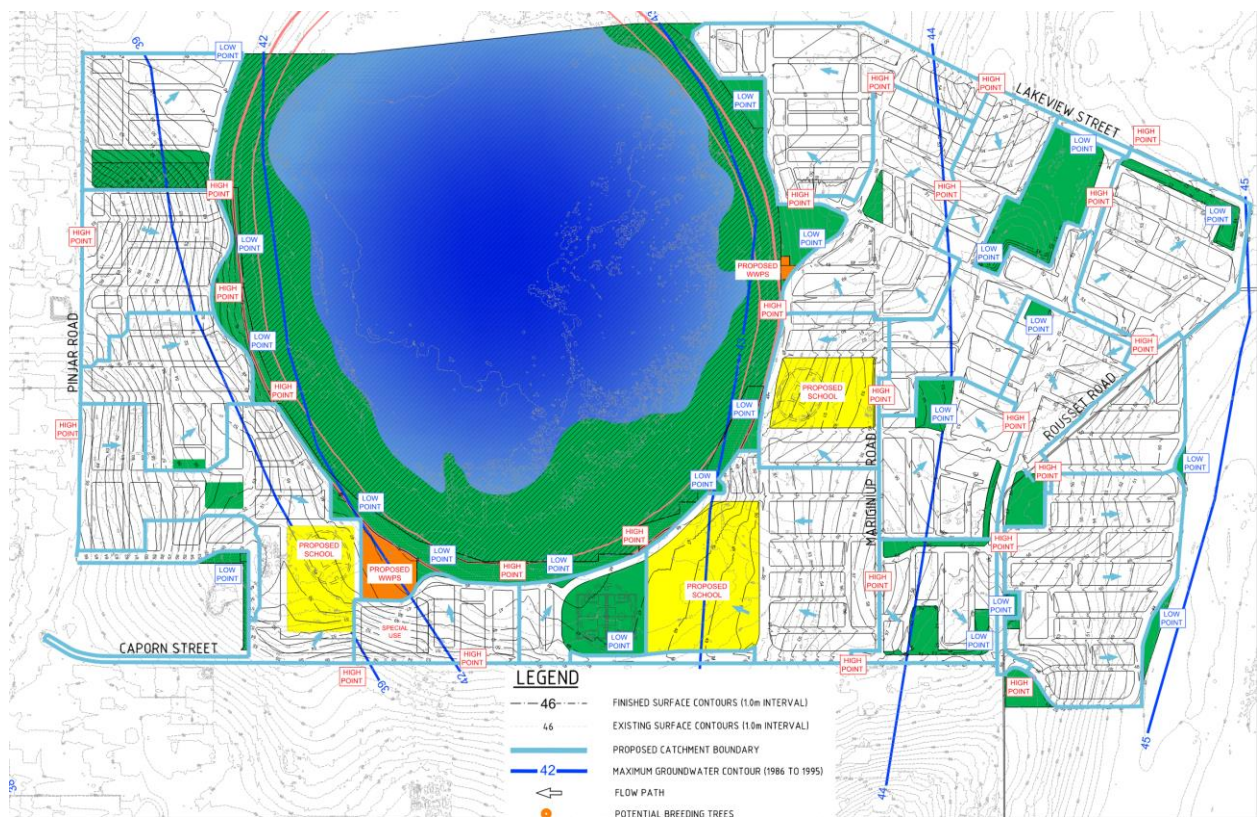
Stormwater Drainage Catchment Plan (TABEC)
